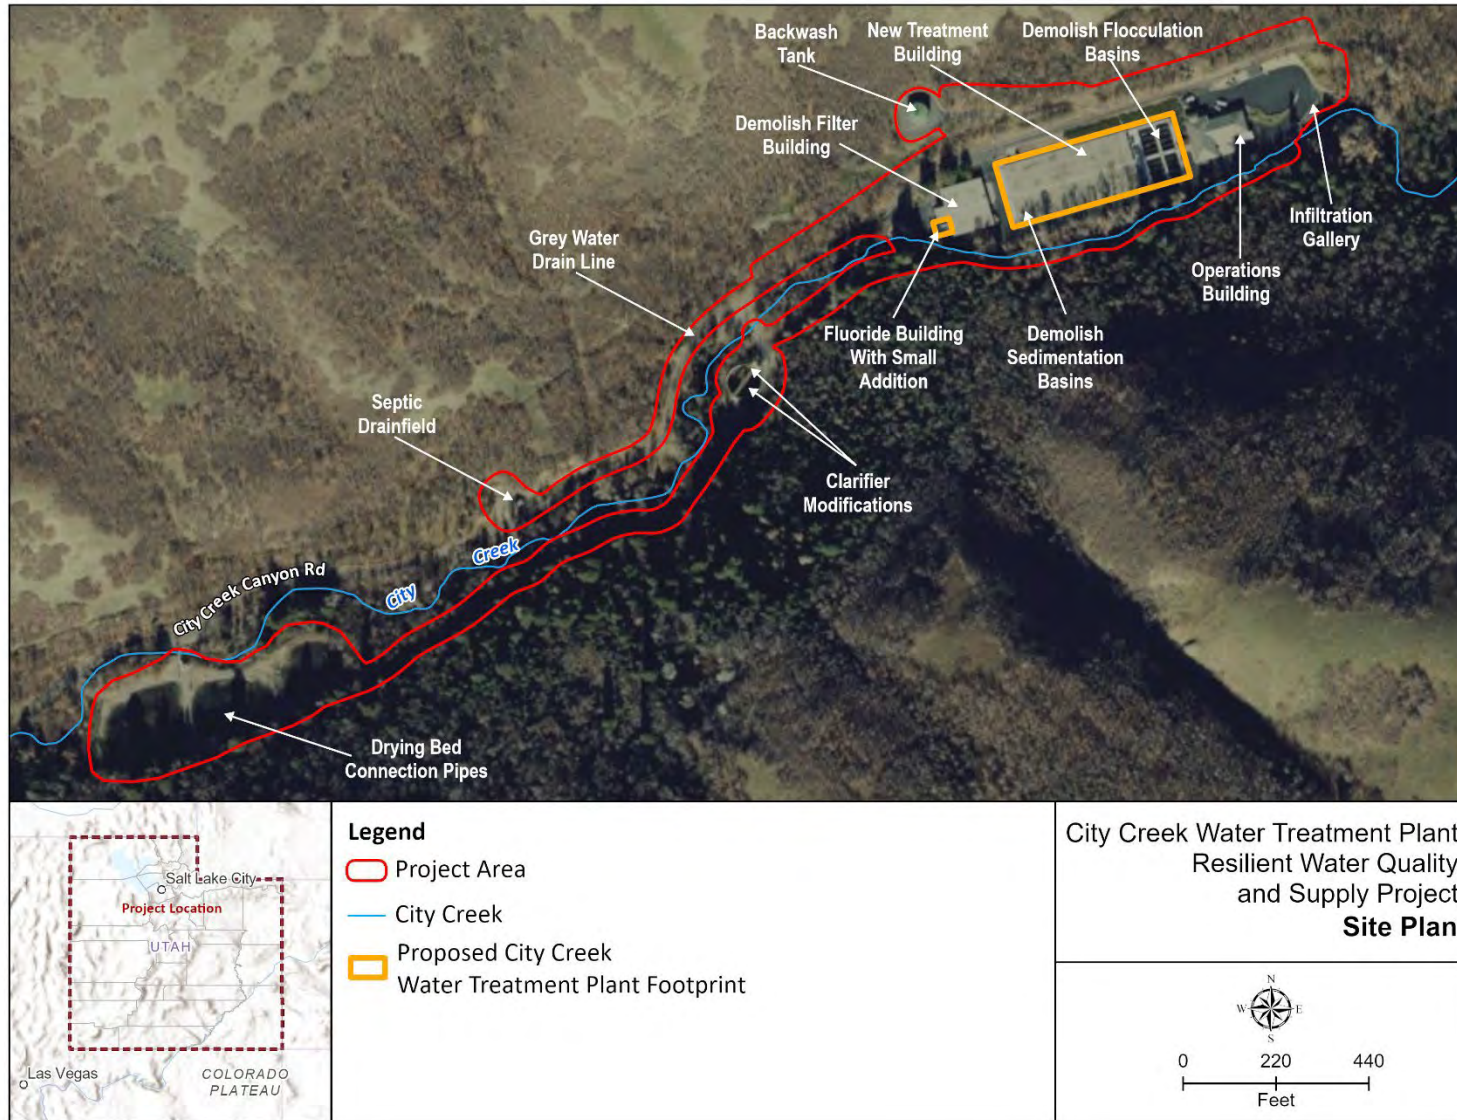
Proposed City Creek Water Treatment Plant Improvements
